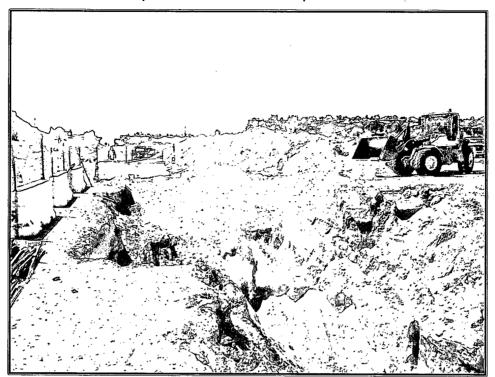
Backfilling of the south portion of the Lateral C-7 Pipeline excavation.
